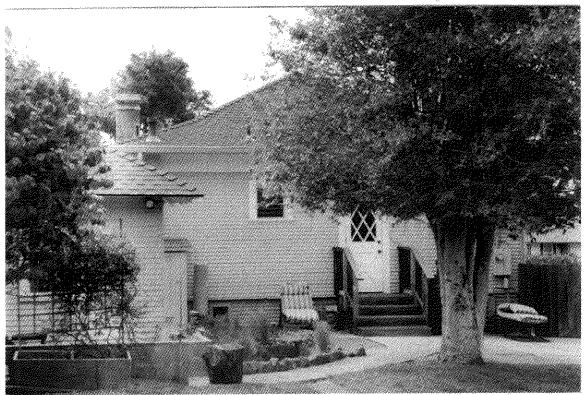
Looking west at the rear (east) elevation, note small window for proposed reuse, April, 2015.
